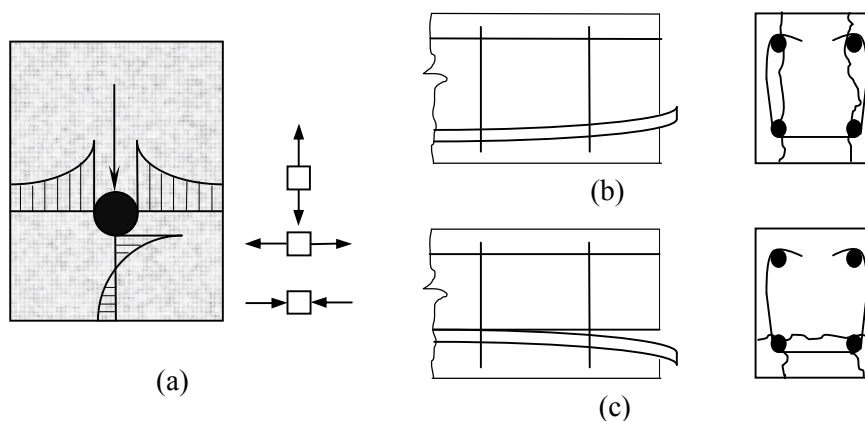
Dowel action: (a) local stresses, (b) bar acting against the concrete core, (c) bar acting against the concrete cover
